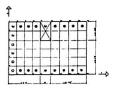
Erection of the Typical Floors Progressed at a Rate of about one Floor per Day
